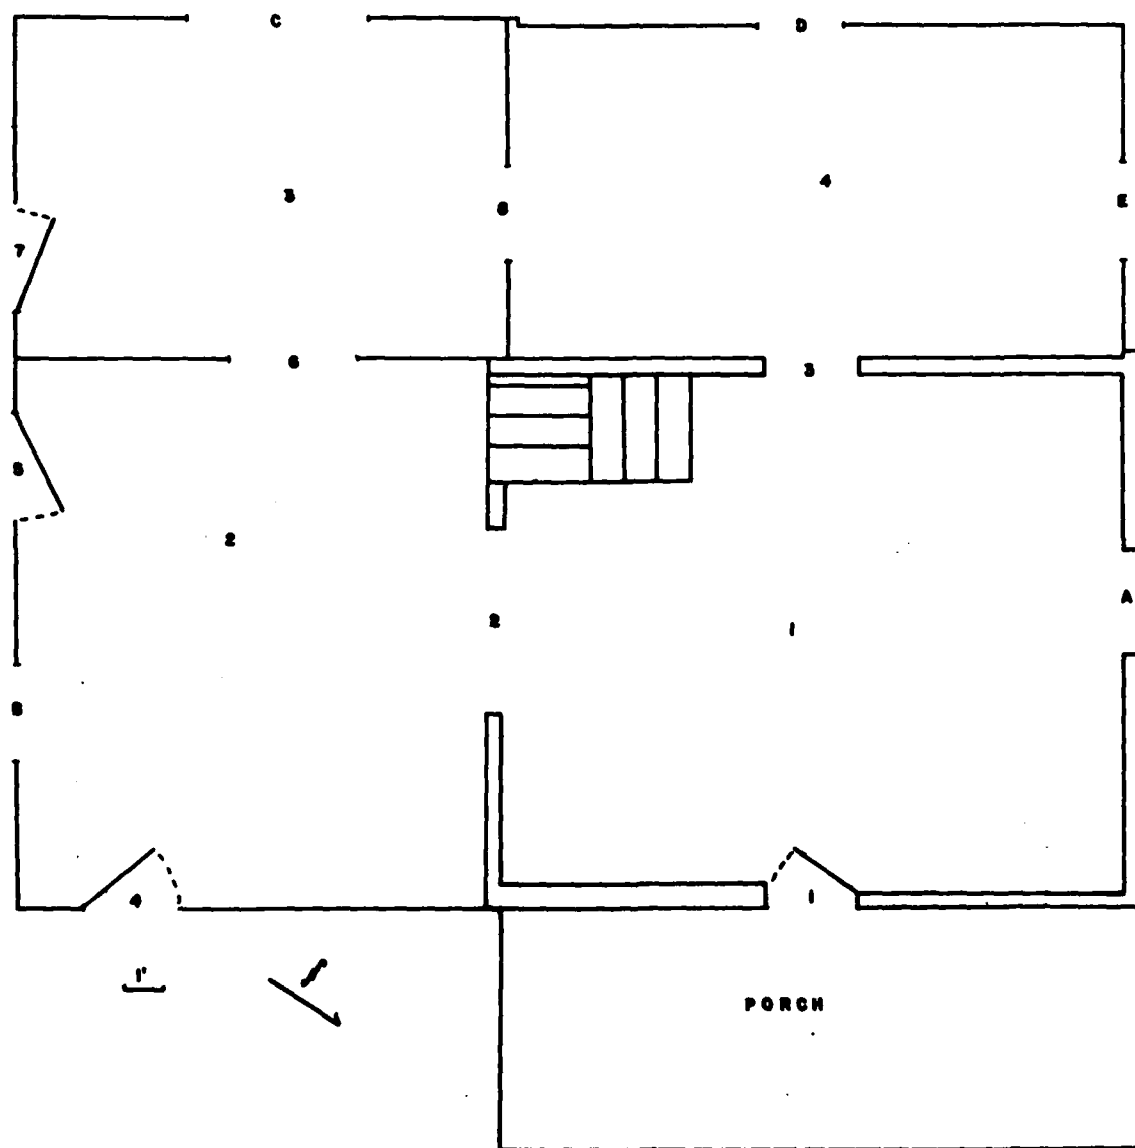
Lower story floor plan of the J. C. Jenkins combination frame and log construction dwelling on Tract 704.
